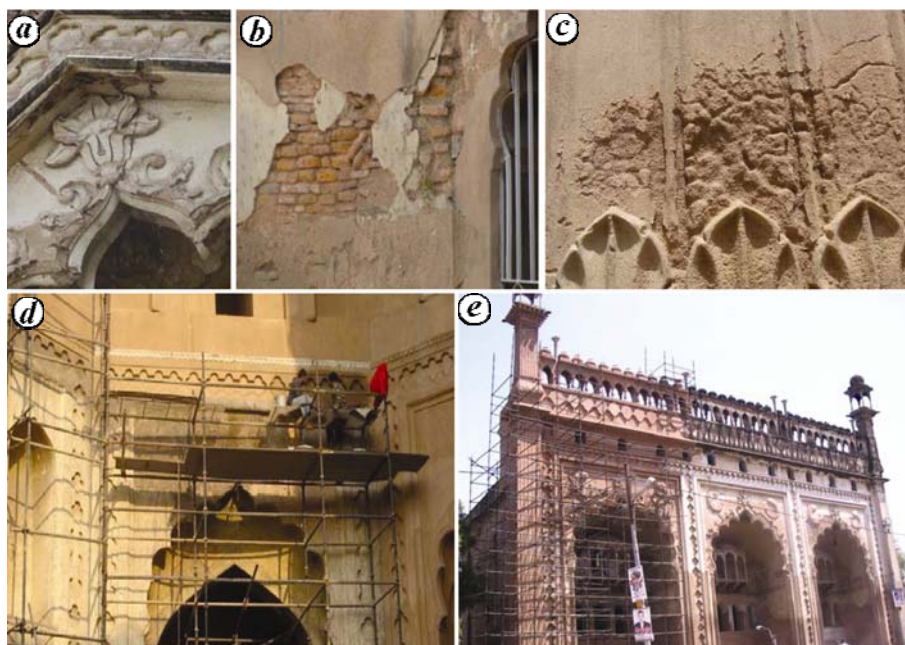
a*, Major cracks at the crown of the arch. *b*, Spalling of plaster from the walls. *c*, Deterioration of recent renovation work carried out at Naubatkhana. *d*, Renovation at Rumi Darwaza. *e*, Renovation at Naubatkhana.
